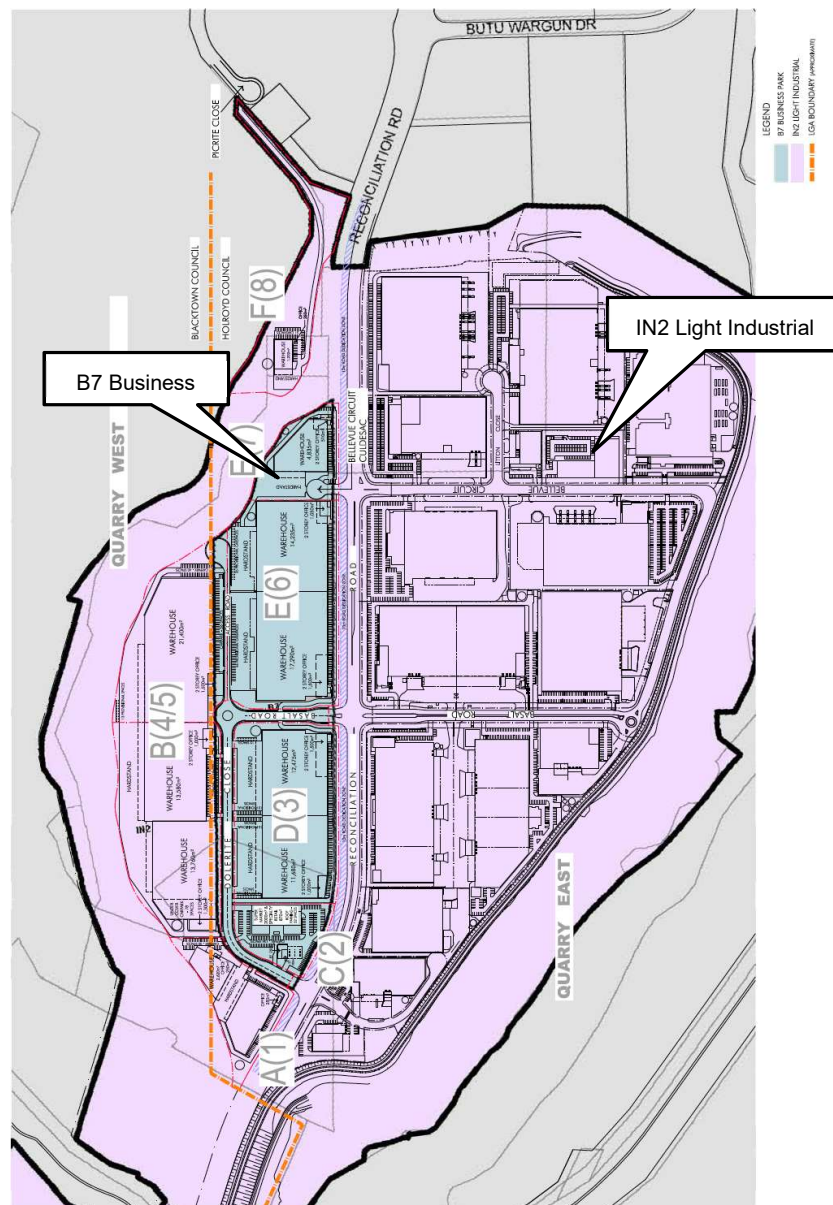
Zoning Plan (showing original masterplan layout) (Source: Nettleton Tribe)
